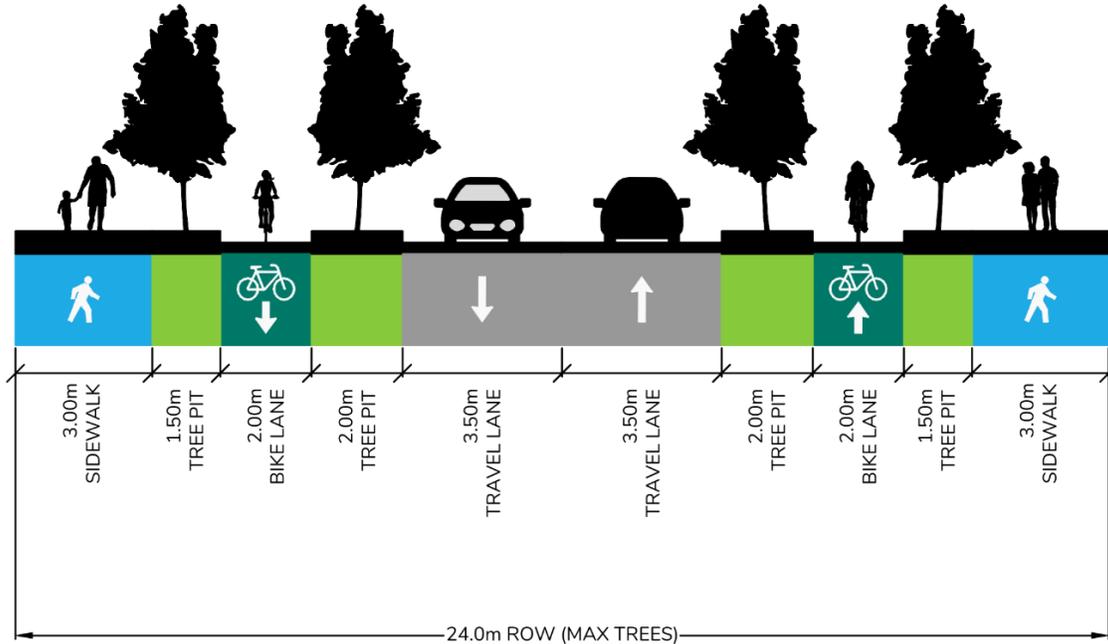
Oak Street Cross Section – Maximum Landscaped Area
